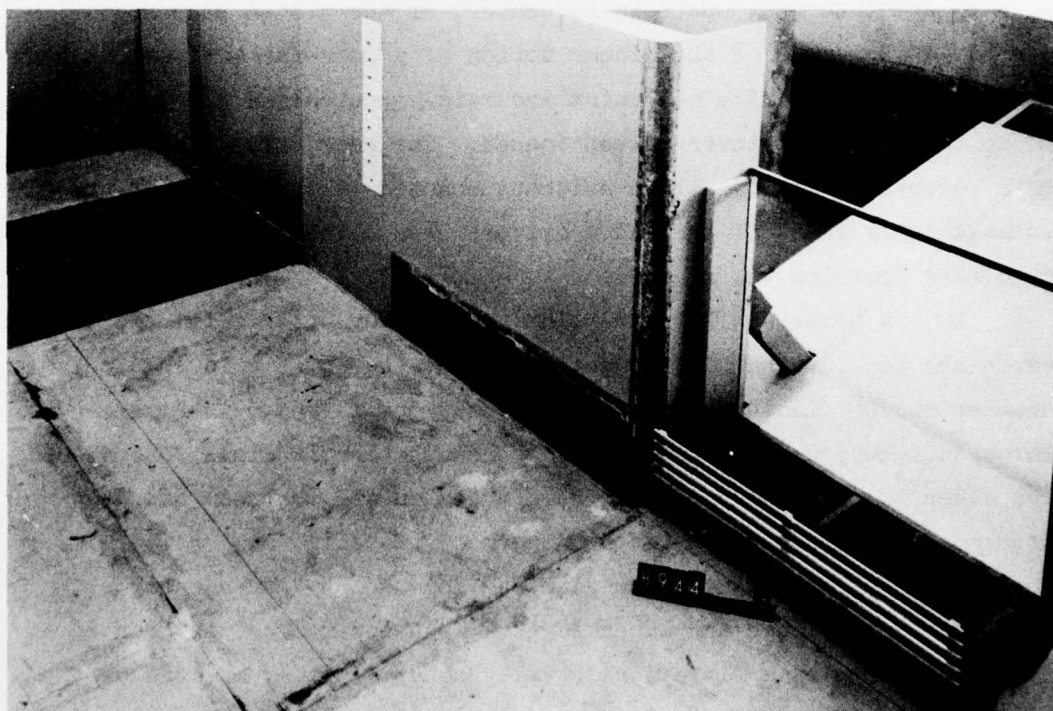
Upstream view of original design outlet manifold and floating guide wall
